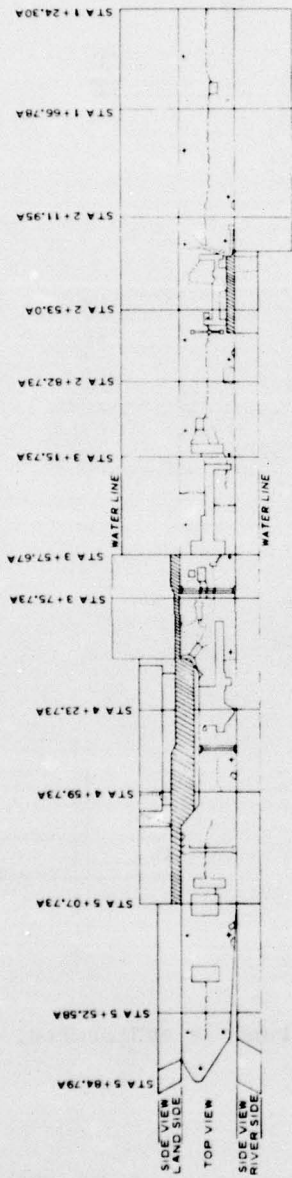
Crack survey, land wall--lower half, tunnels and shafts, Montgomery Locks and Dam, Ohio River.
